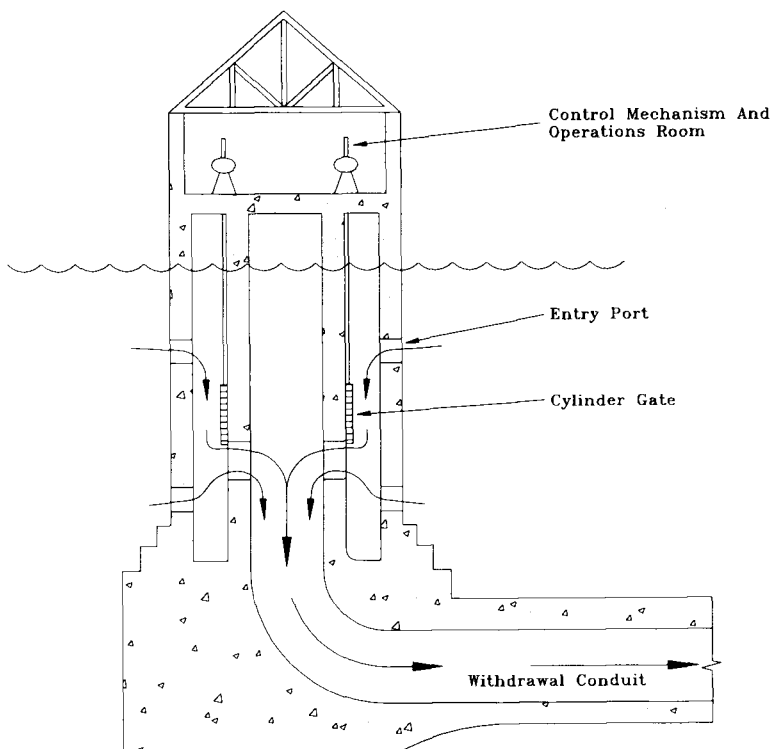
Section through a wet intake tower (Linsley and Franzini, 1972).
